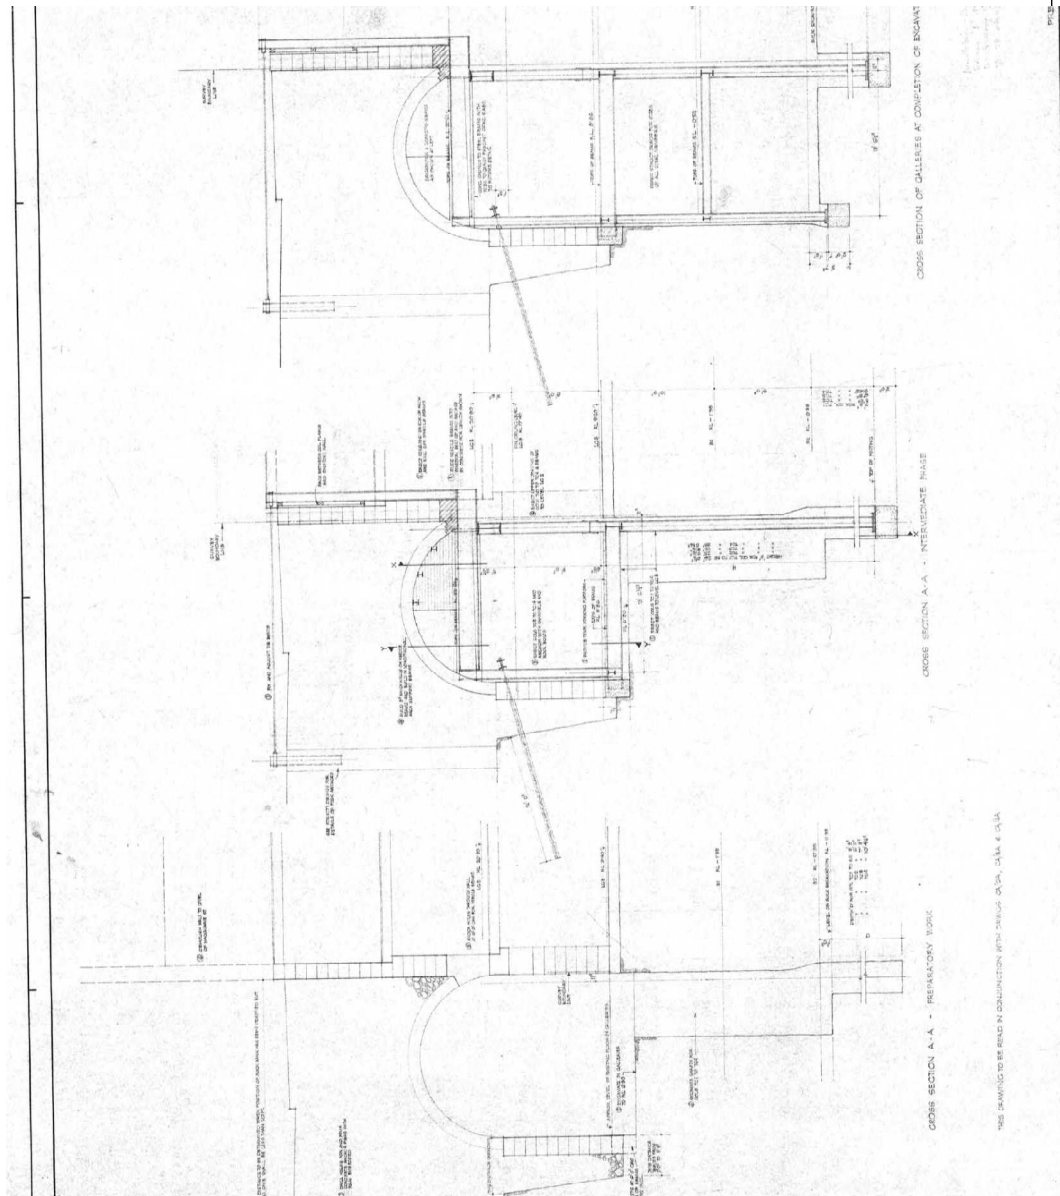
Plan of the British Tobacco Company Building (Source; Demolition and Excavation Scheme 'B' Modifications to Gallery Construction, Stephenson & Turner Architects, 1963).
